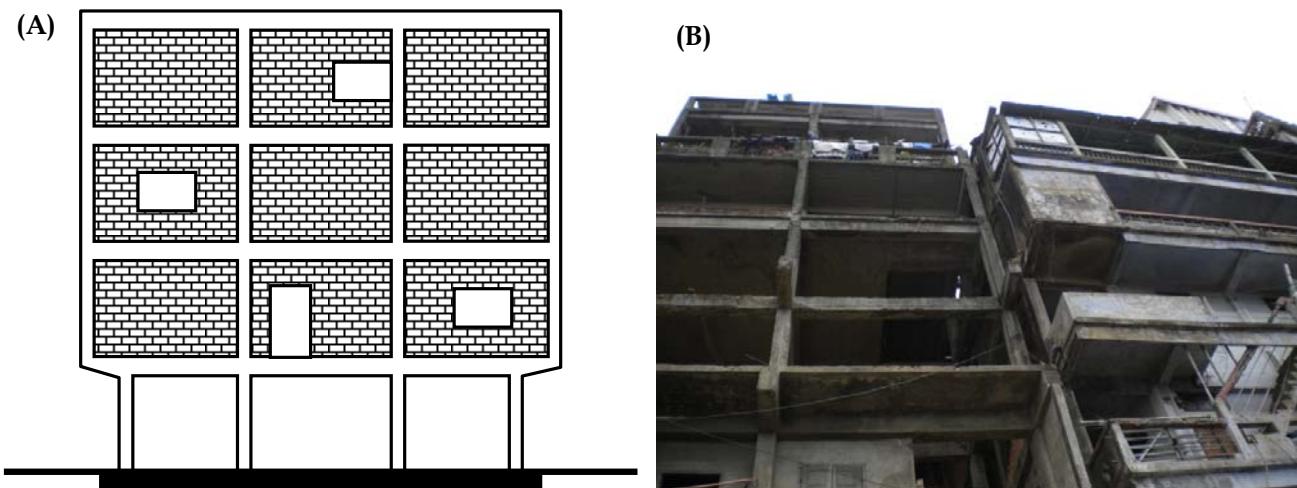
(A) A sketch showing the columns offset at the lower storey for architectural and functional reasons; (B) An example of a building with floating columns
